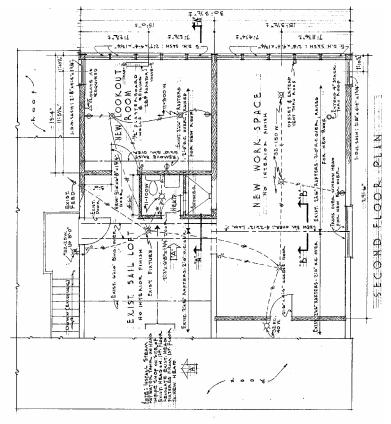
Interior layout of south end of Building 31, second floor. Note location of stairs to match floor layout to first floor.
